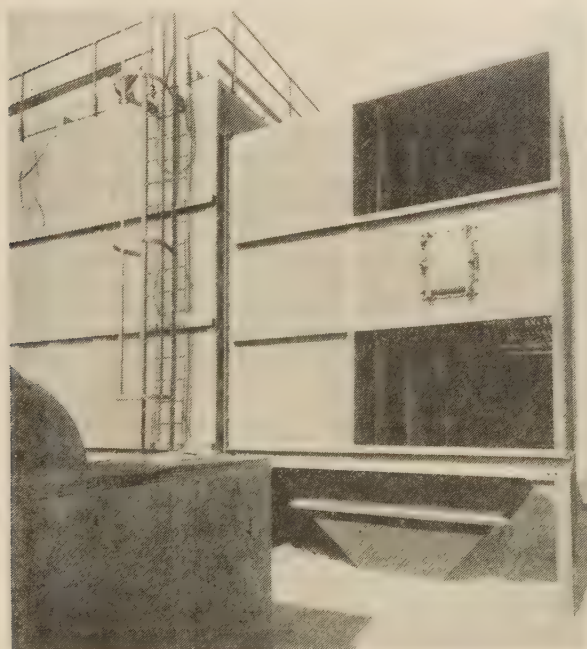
DETAILS OF GAS-MIXING CHAMBER, SHOWING ARRANGEMENT OF TURNING VANES AND PUNCHED PLATES
